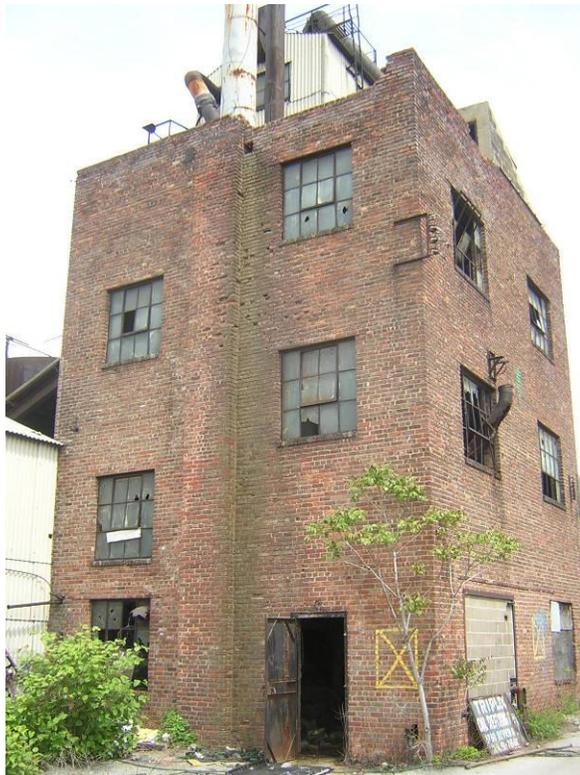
Three Story Building at 37-80 Review Avenue
